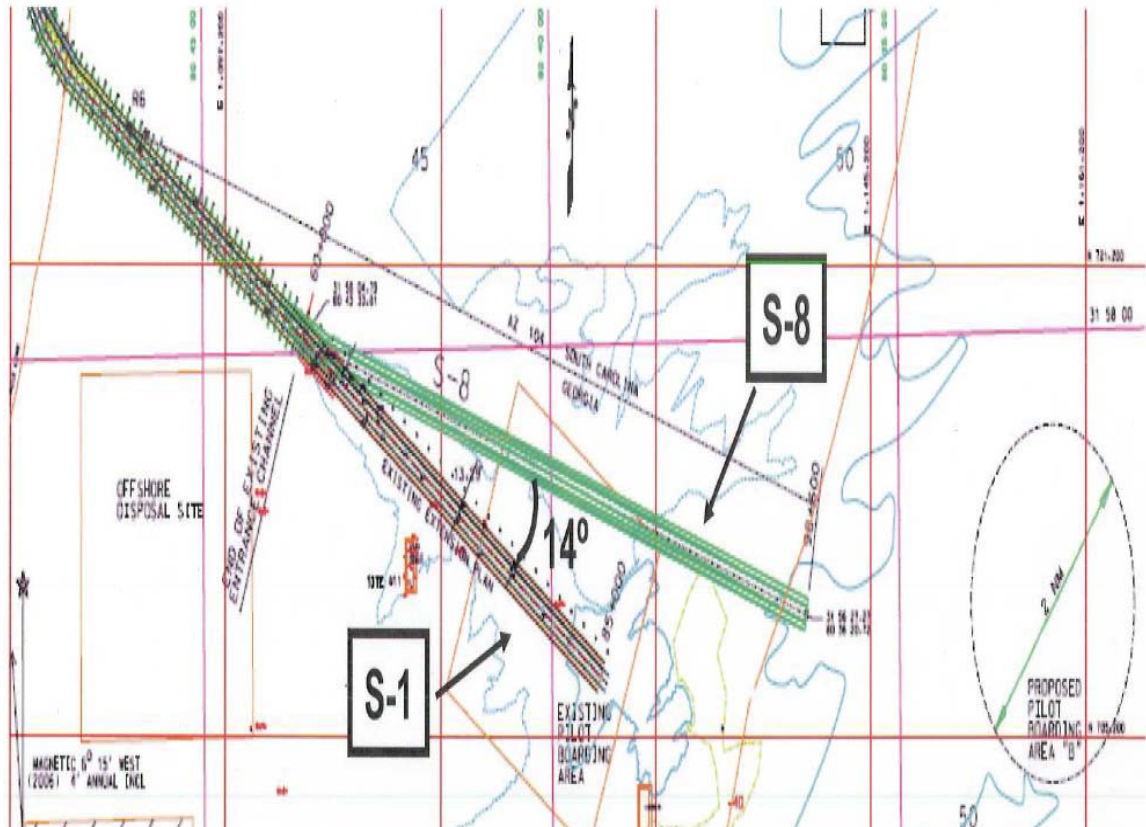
Reconfigured Ocean Bar Channel Alignment. (S-1) Existing Extension Plan, (S-8) Proposed Extension Plan
